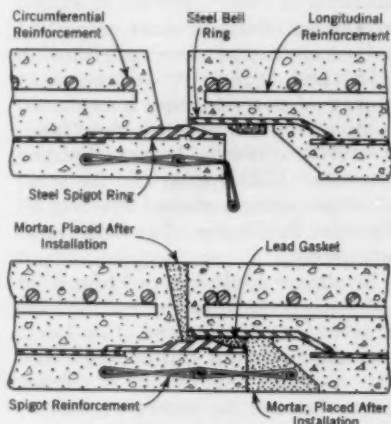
Lead-and-Steel Concrete Pipe Joint
